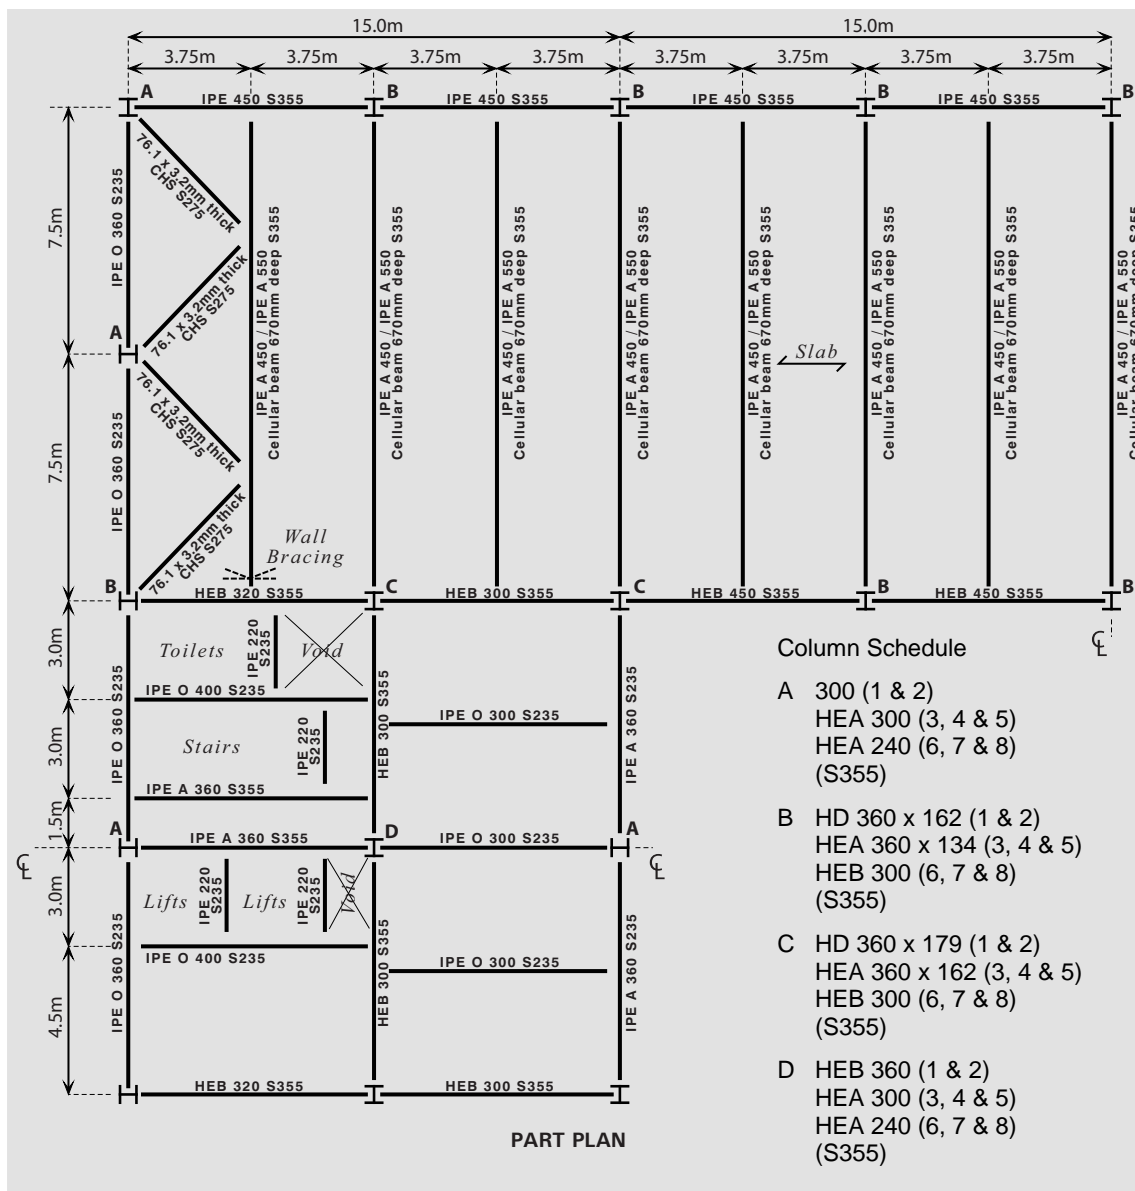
Cellular beams (long-span secondary beams) – example of steelwork arrangement at the corner of an 8 storey building with an atrium
